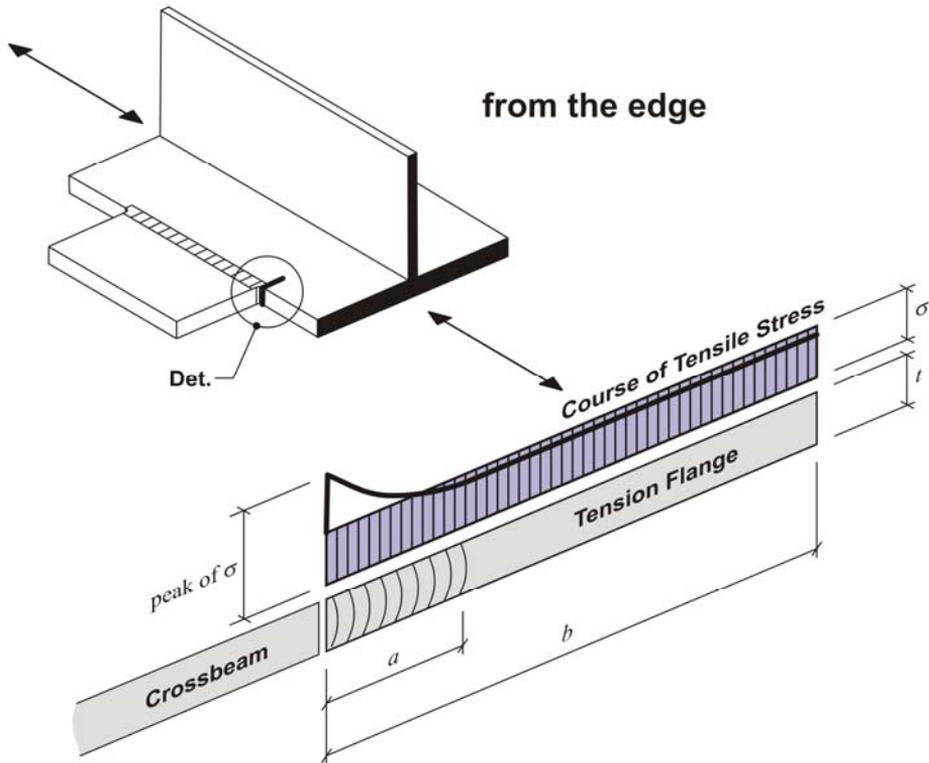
Detail of a bridge structure which is subject to fatigue damage
